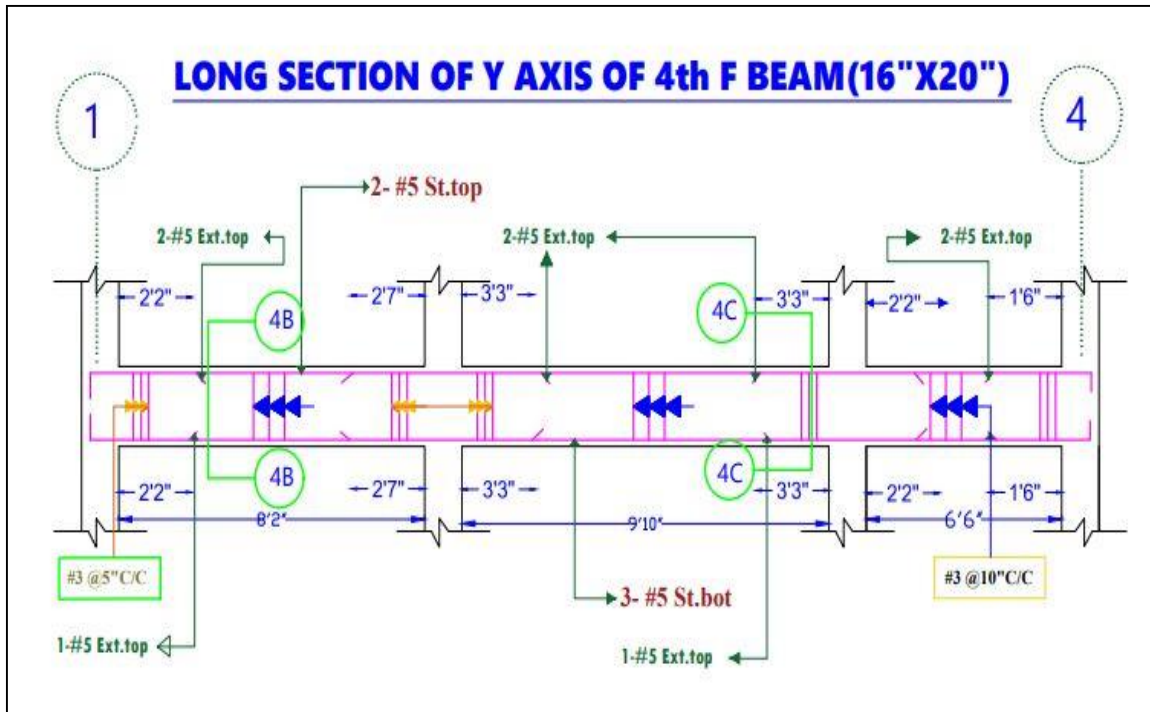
Beam Detailing & Cross Section of Y-axis
